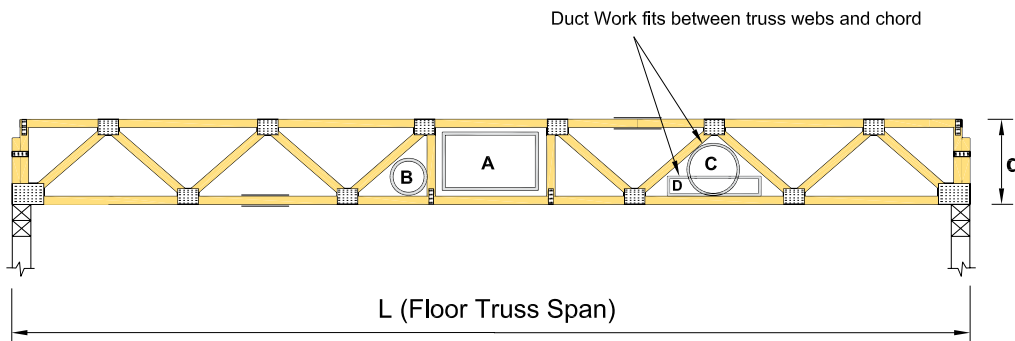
Typical 4 x 2 floor truss configuration with mechanical chase opening located near truss mid-span.
